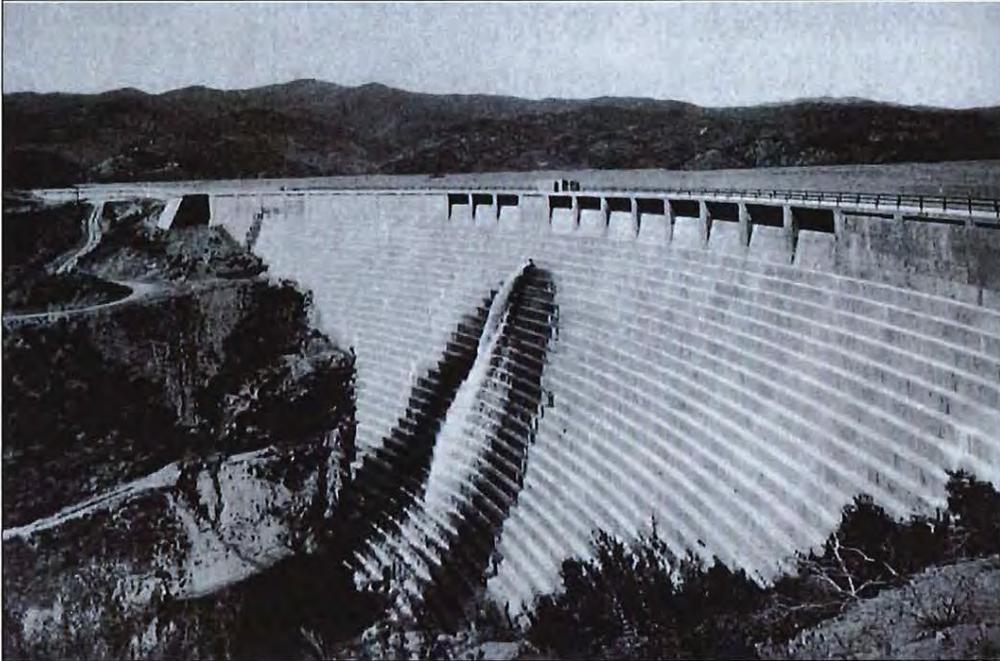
St. Francis Dam before failure (Huber Collection, U of Calif Water Res Center Archives)
